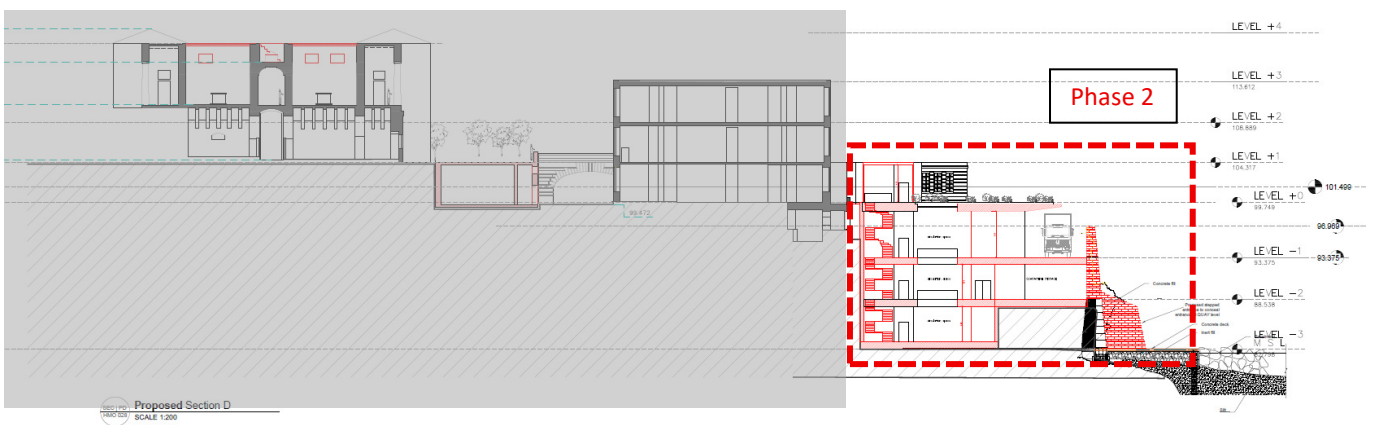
Existing buildings in section. – The area marked in yellow is the area highlighted below is the proposed excavation and construction of the new dedicated spaces.
